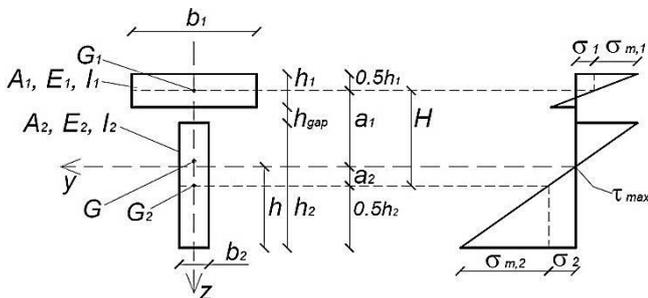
Reference cross-section for a composite beam with flexible connection and subjected to flexure, with corresponding distribution of normal stresses.
